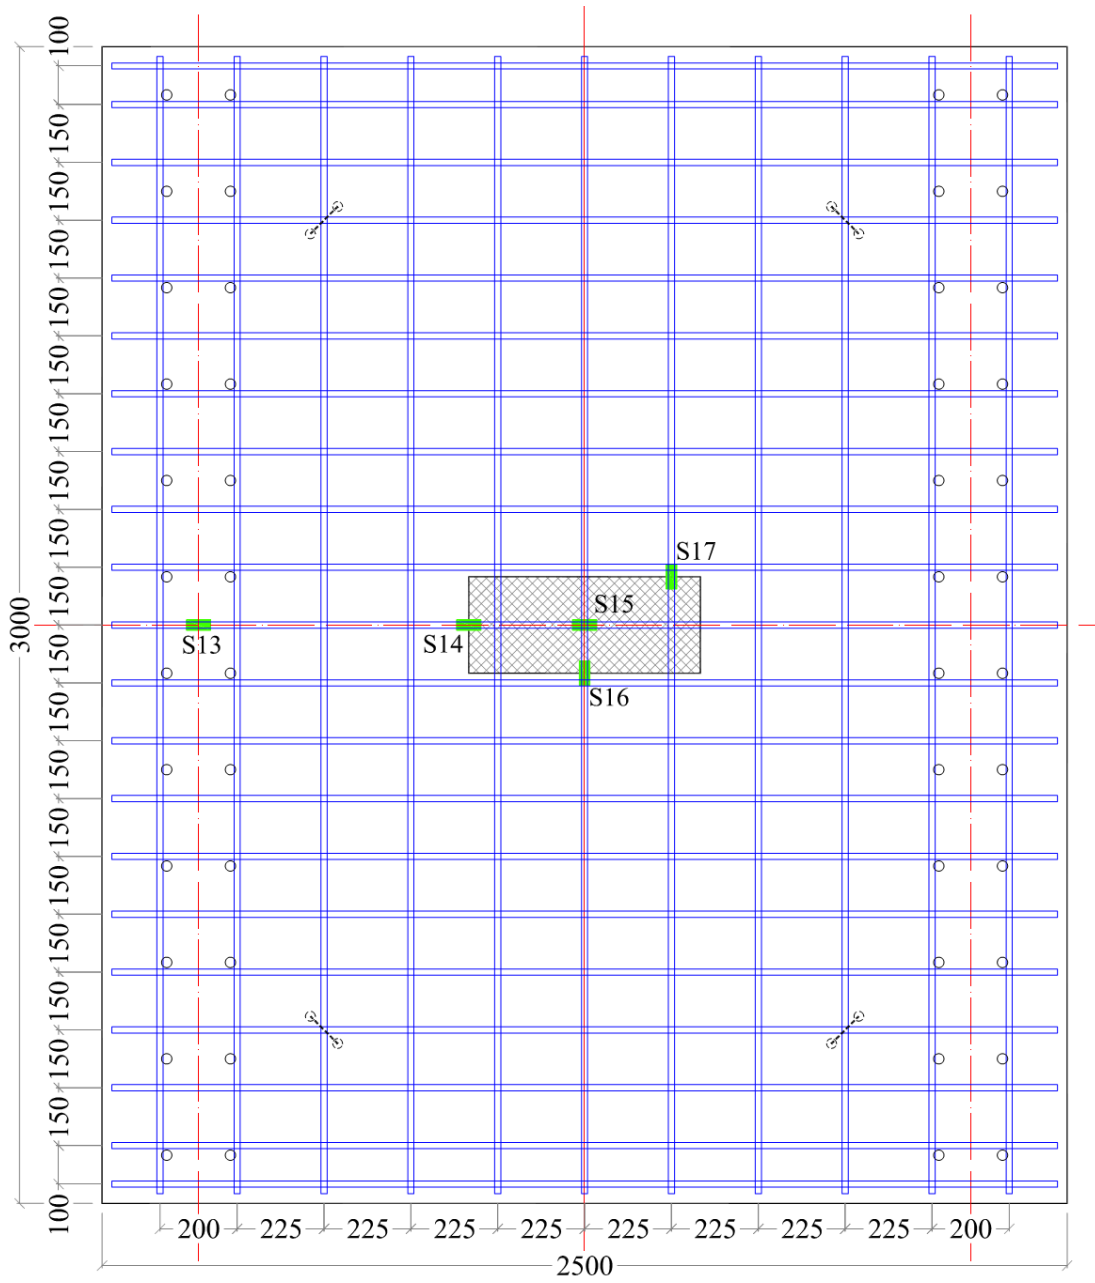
Typical location of strain gauges on the top reinforcing bars
